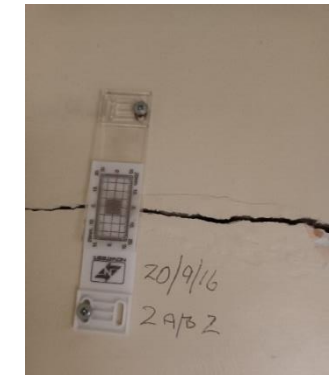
Movement gauge showing minimal further movement to one of the solid walls at level 3 Kneller Hall main house (west wing)
